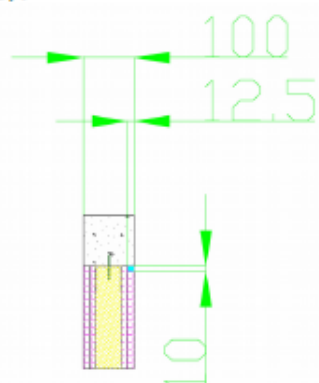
wall gypsum to stone thickness  $\geq 100$  mm
